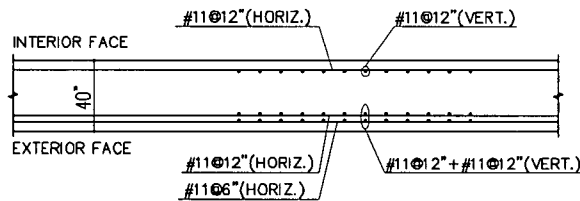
Typical Reinforcement in West Exterior Wall – SECTION 1 (Sheet 1 of 2)
